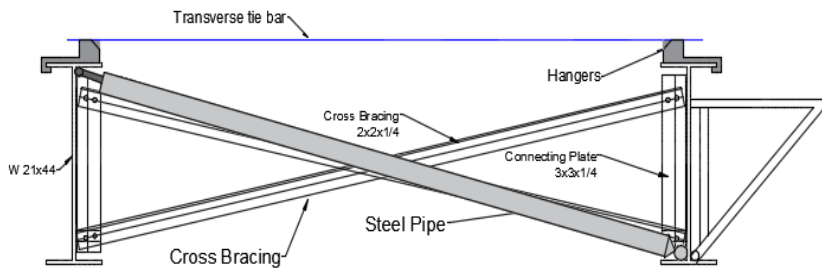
Cross section with transverse tie + horizontal pipe (UDT + DP).
